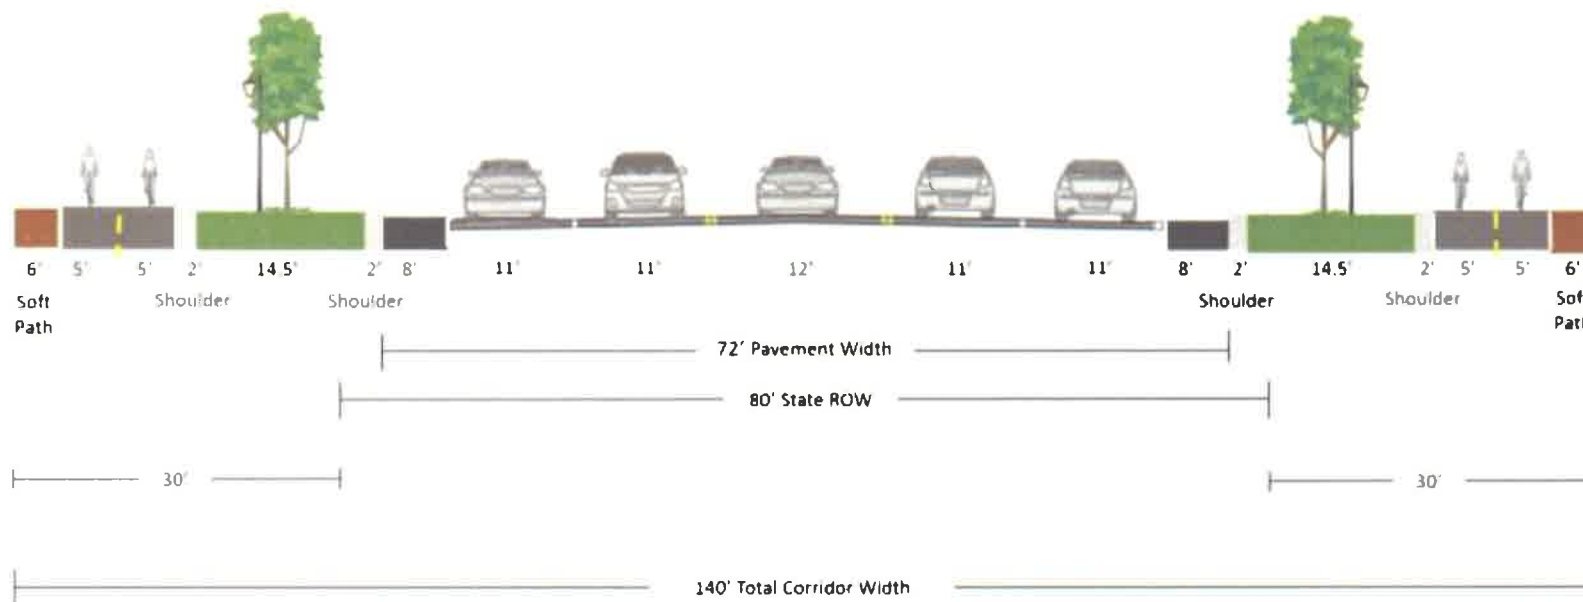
Alternate Cross-Section (See Vee Lane to Wye Road at US 6/North Main Street)
